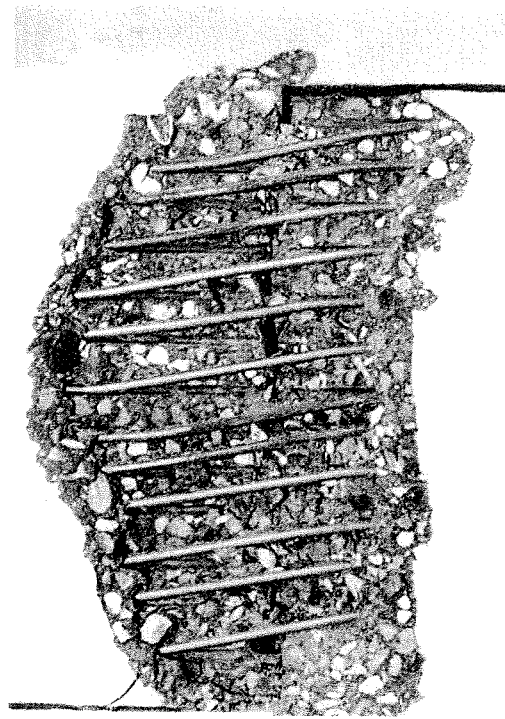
Final collapse state of 1% steel-reinforced specimen.
